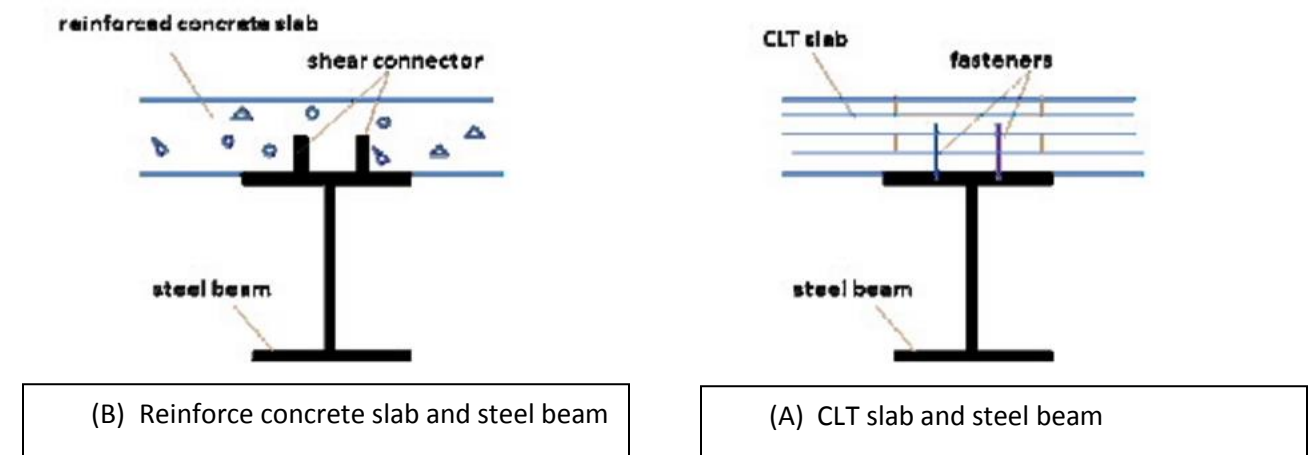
Floor system of multi-story buildings (Asiz, Ahmed, 2013)
